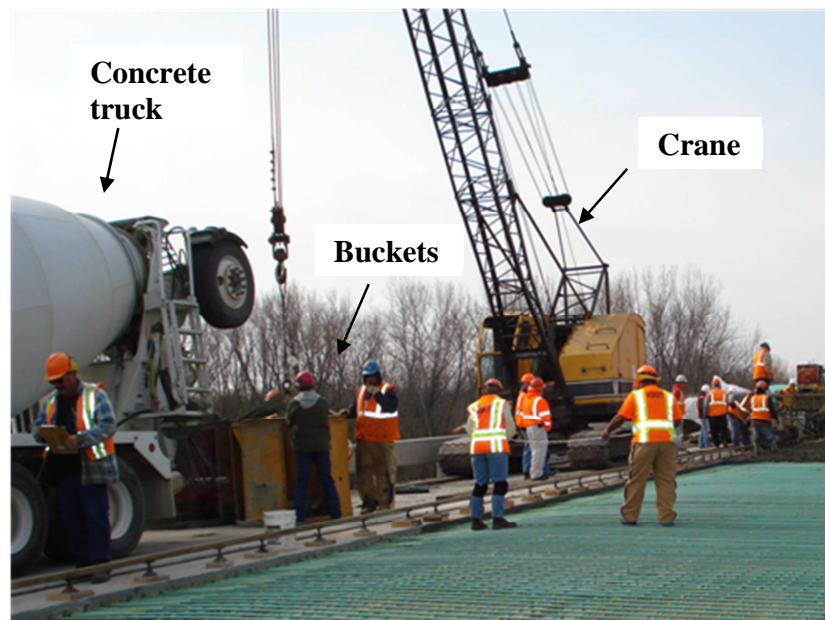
Heavy load during construction for LC-HPC 12-p2
